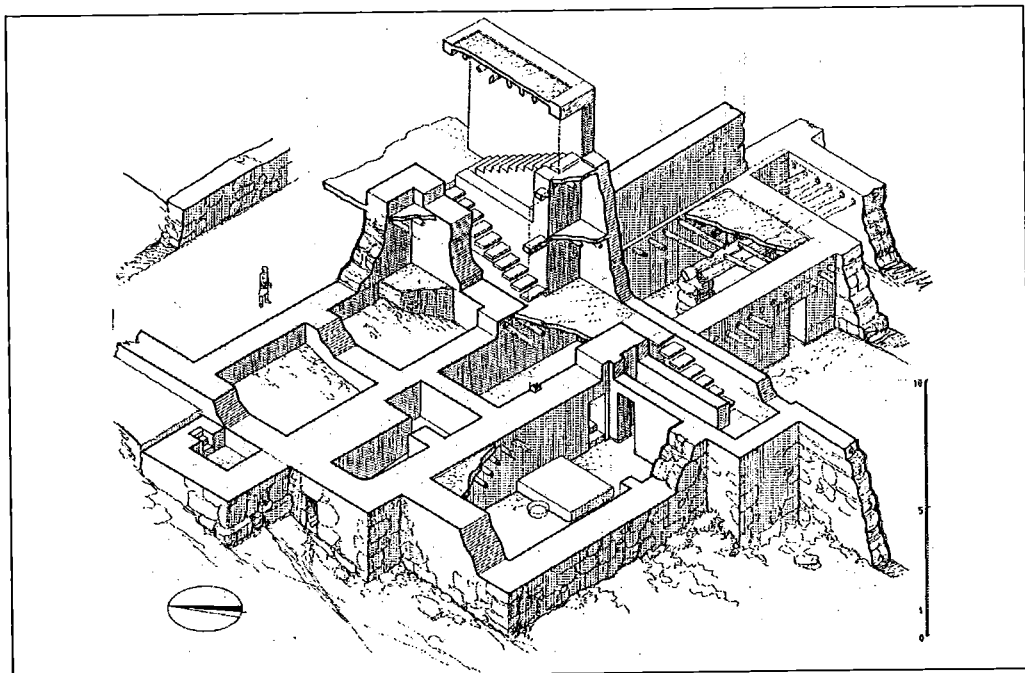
Isometric plan of Epano Zakros, with the first reconstruction of the staircases (by Chr. Kanellopoulos).
